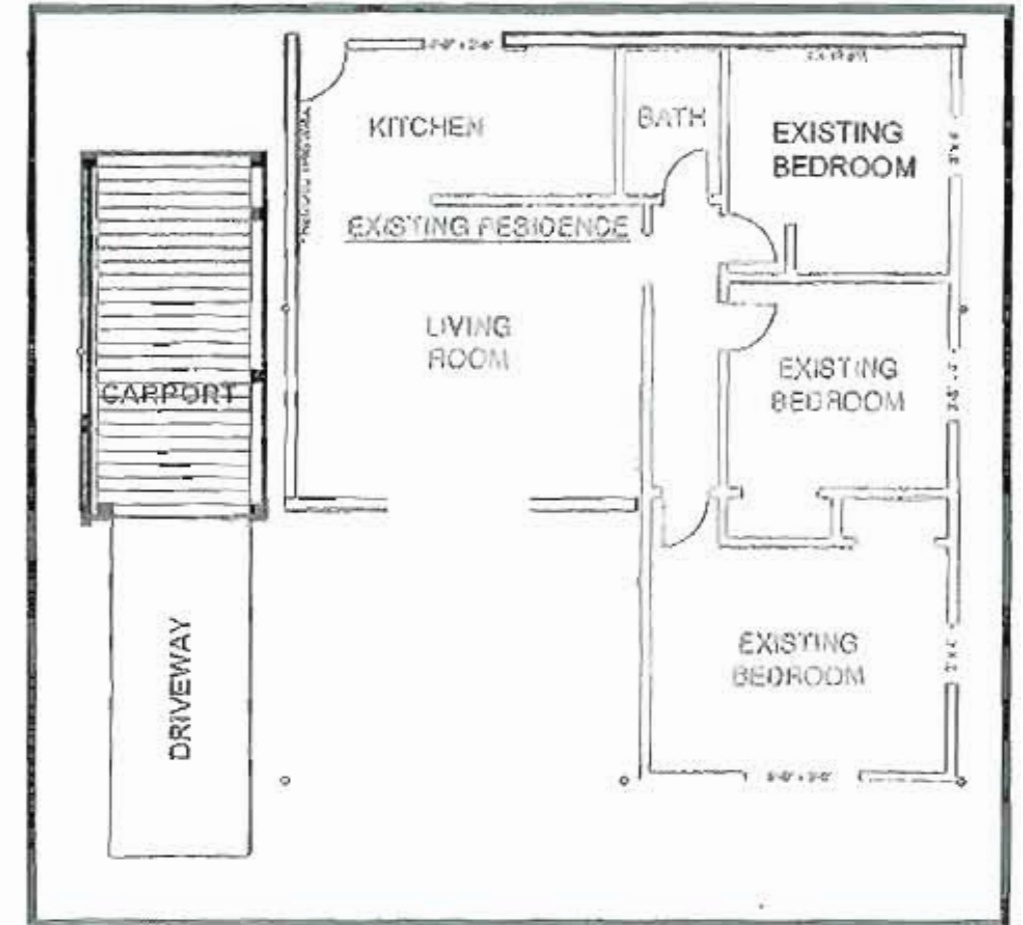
CENTRAL LIVING ROOM/KITCHEN PLAN
